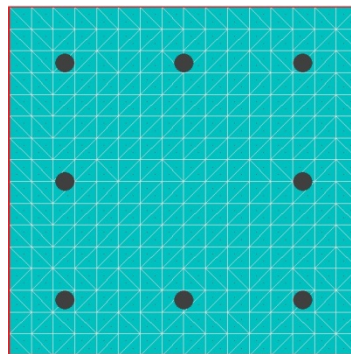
CFRP Jacketed Column 5A13 Cross Sectional Detail
